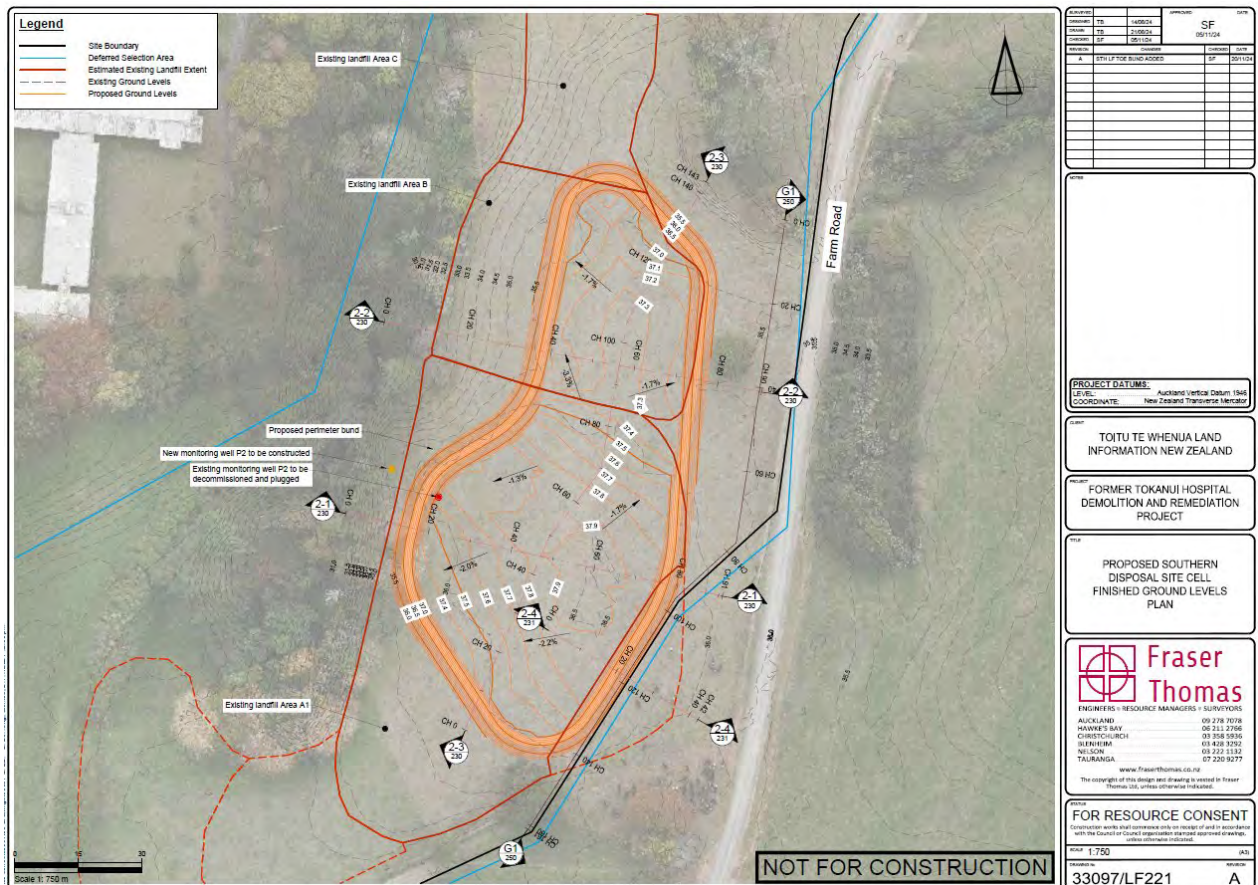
Proposed Southern Disposal Site Cell – Finished Ground Levels Plan
